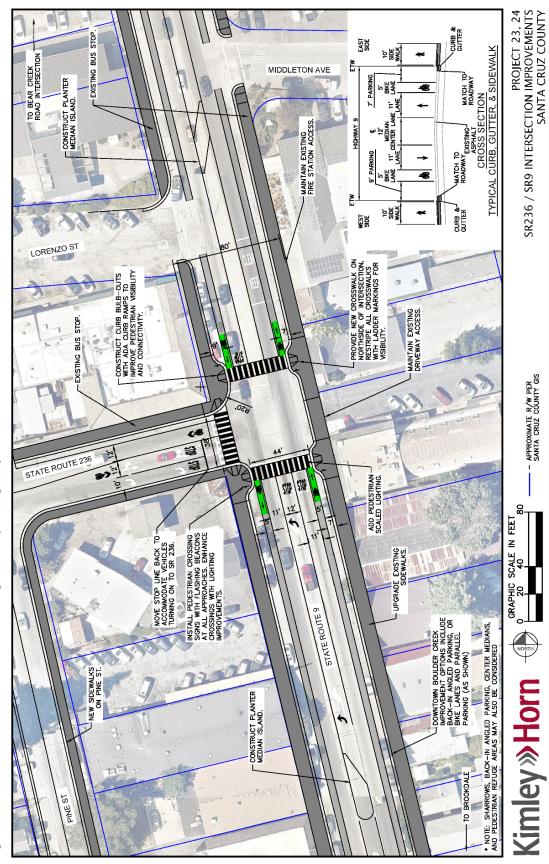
Boulder Creek Town Center Design Concept – Highway 236 Intersection
